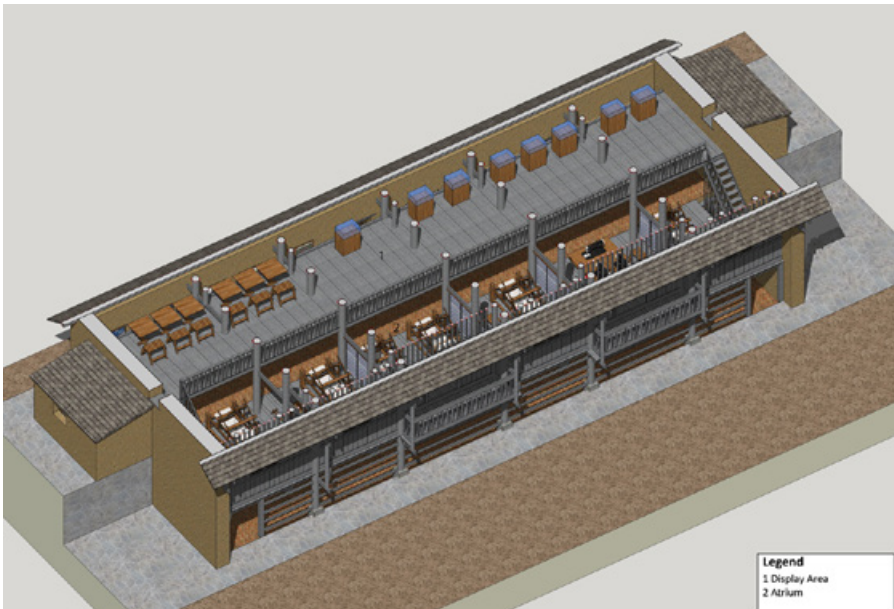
Upper floor plan of the embroidery workshop. (Source: Author)
